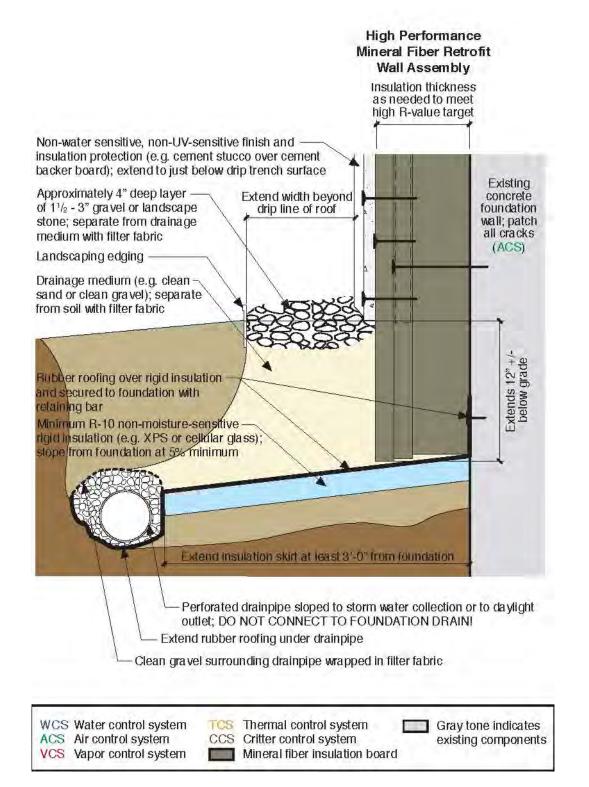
Schematic detail for insulated ground roof/foundation skirt with a high performance mineral fiber retrofit foundation wall assembly
